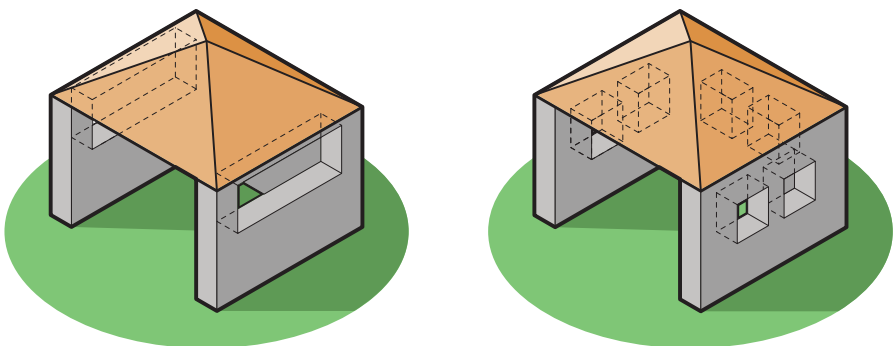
Examples of structures that have one open side, and 30% or more of the remaining wall area open and unobstructed.
